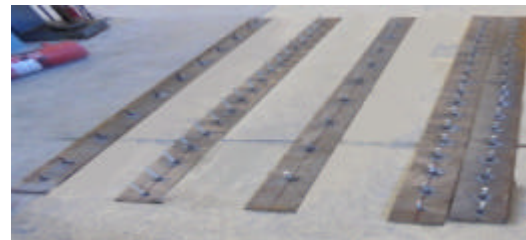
Shear connectors attached to the steel plates by collar welding
